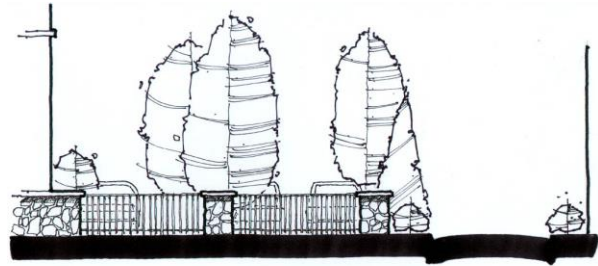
Any parking on the sides of buildings near the public street shall be screened with a decorative fence or wall or landscape screen extended at the building line to continue the street wall formed by the building line.
